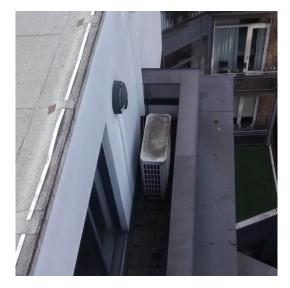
Photograph from roof of Zinc House showing existing heat pump at Balcony Level.
